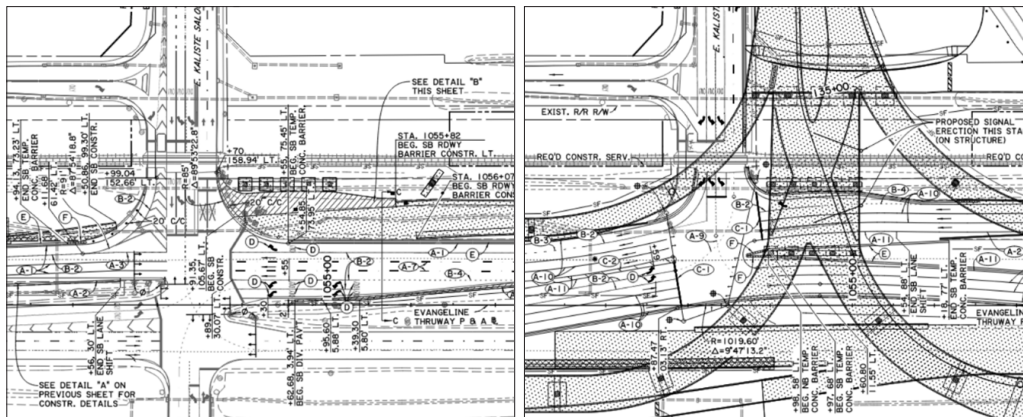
I-49 Kaliste Saloom Interchange (H.004273) – phased the bridge footings providing temporary drainage and an offset bridge alignment for the Railroad overpass.
